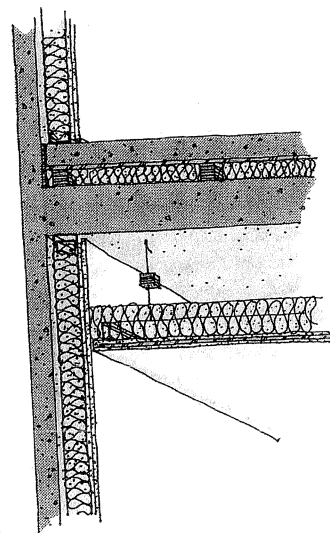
Floating floor construction with isolated ceiling and walls.
